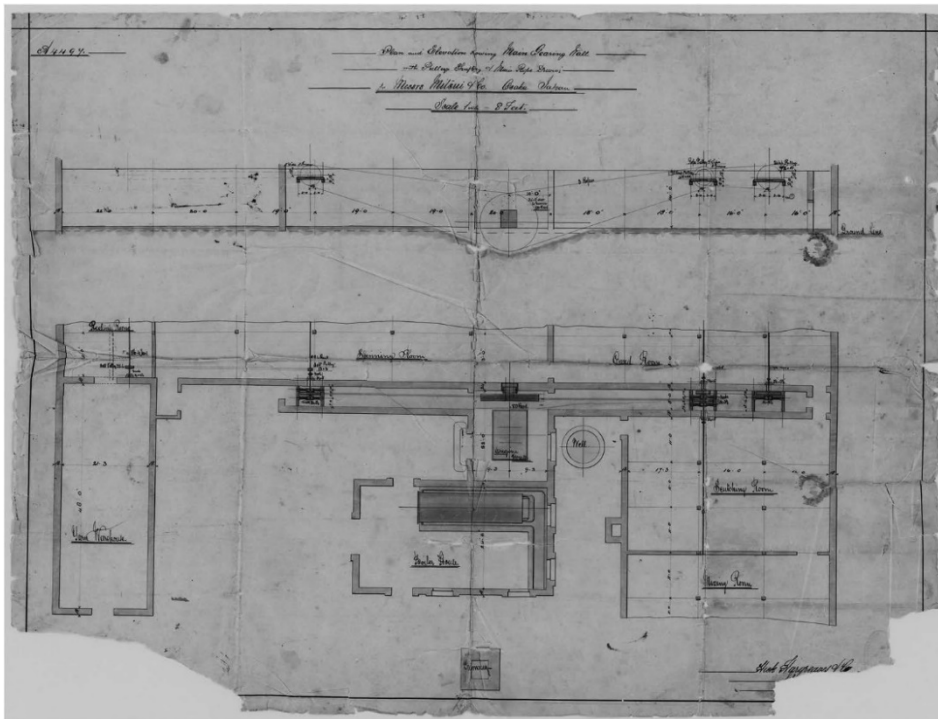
Machinery layout drawing, Mill No. 1 at Osaka Bōseki [2-05]
